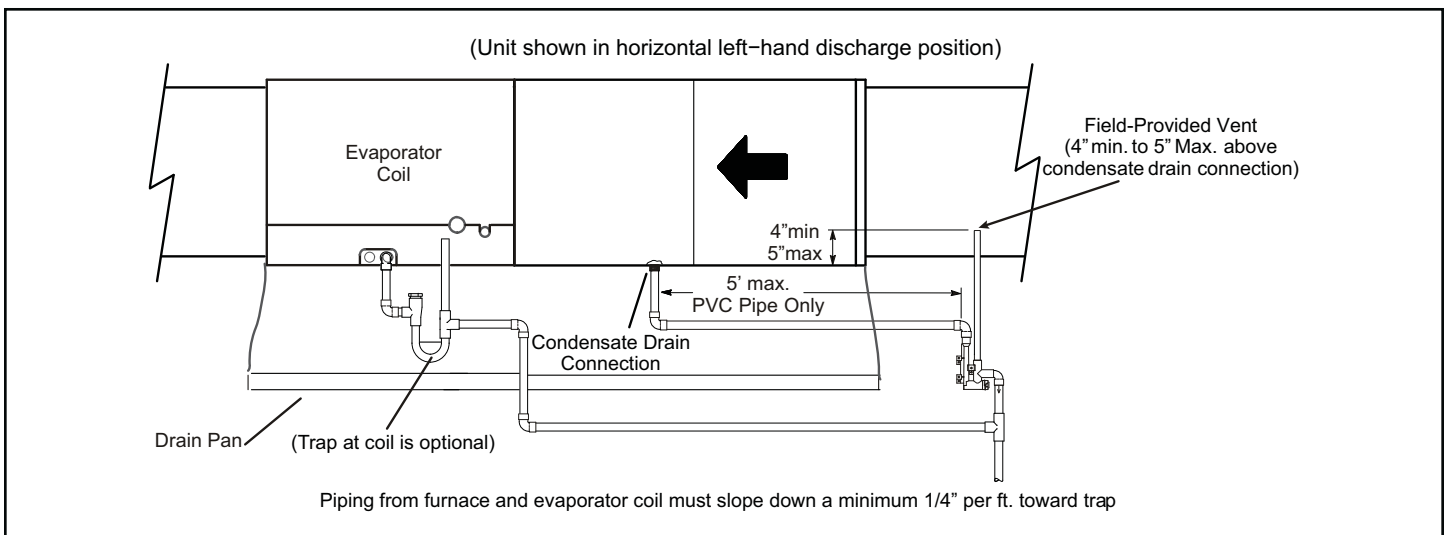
Furnace with Evaporator Coil Using a Common Drain
